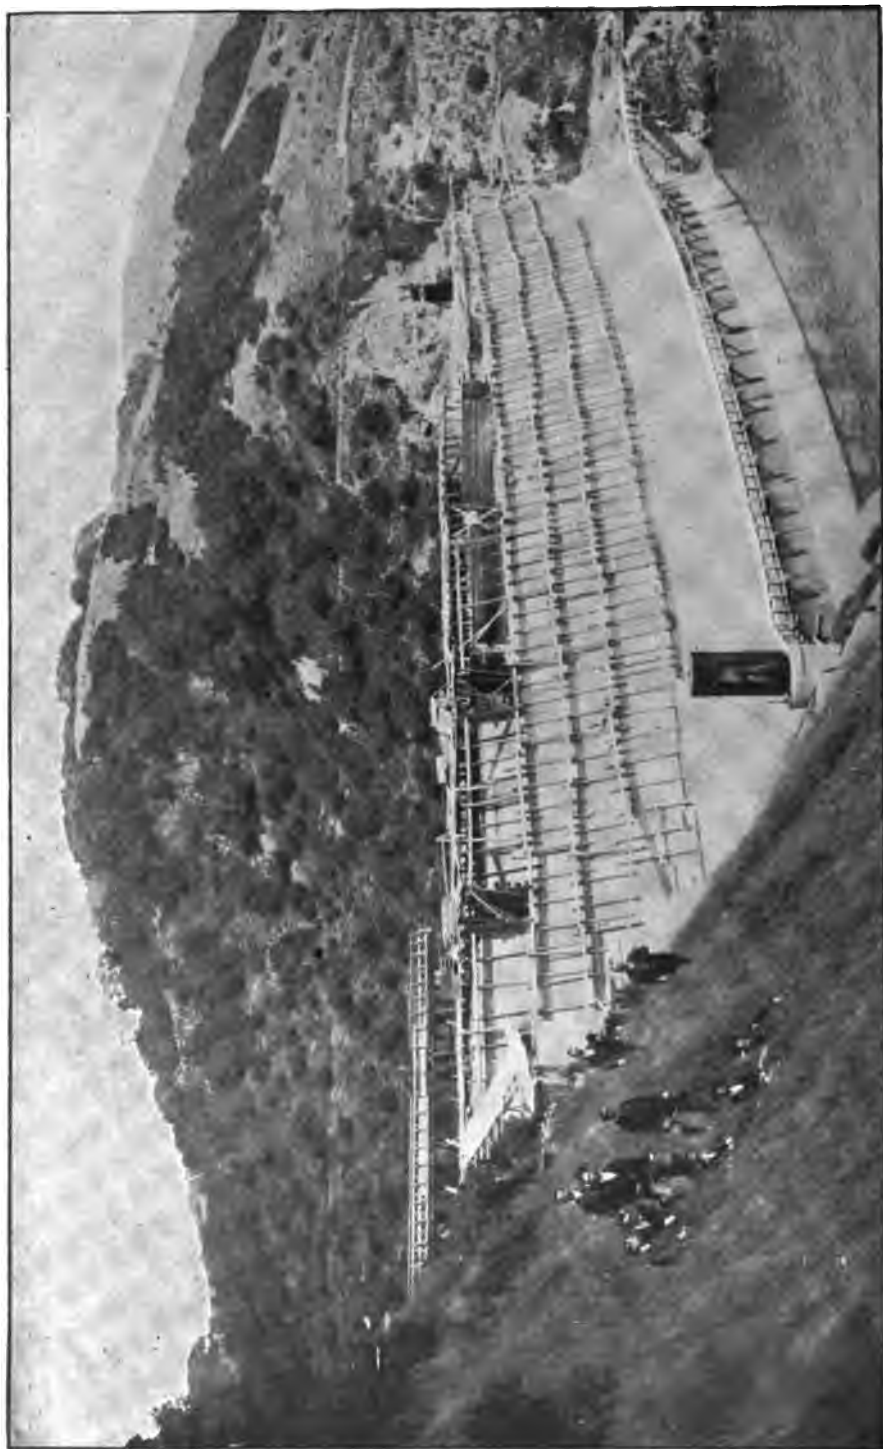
CONSTRUCTION OF INTAKE OF SAN MATEO DAM.
